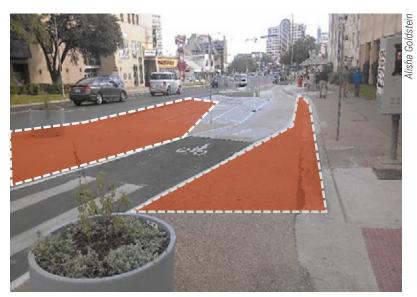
Adding a buffer, such as a stormwater planter, between modes of transportation can control stormwater and improve safety.
